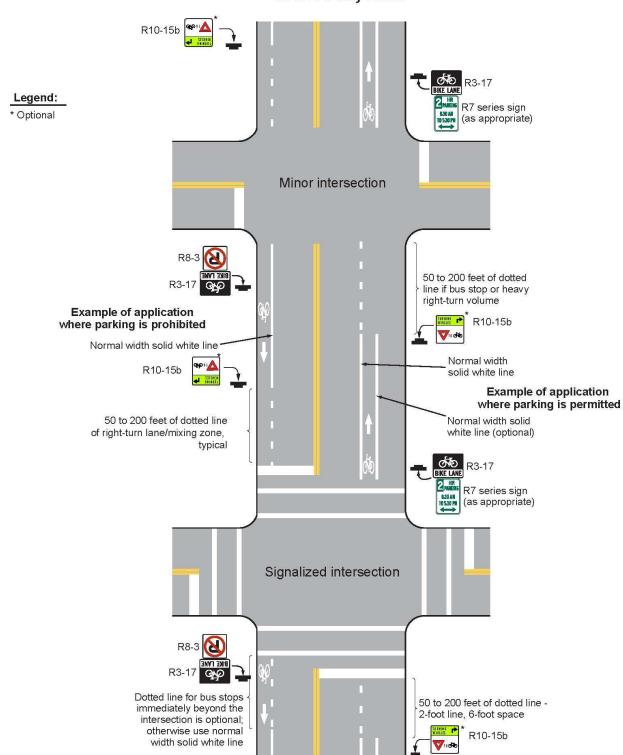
C-6. Example of Pavement Markings for Bicycle Lanes on a Two-Way Street
